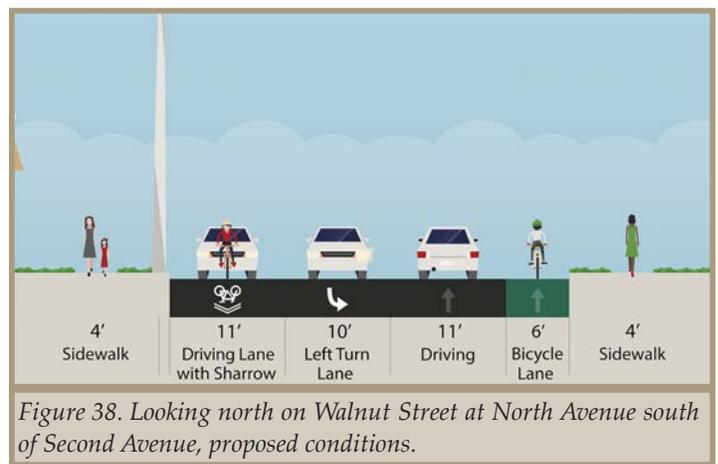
Looking north on Walnut Street at North Avenue south of Second Avenue, proposed conditions.
